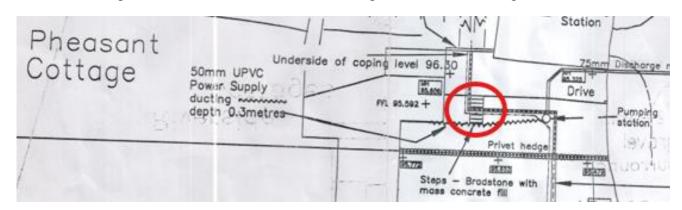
Excerpt from as built drawings showing steps detail at Pheasant Cottage
